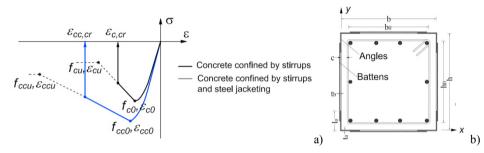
(a) Confined concrete models for the fiber cross-section with and without steel jacketing reinforcement; (b) Configuration of the crosssection of a column reinforced by steel jacketing.
